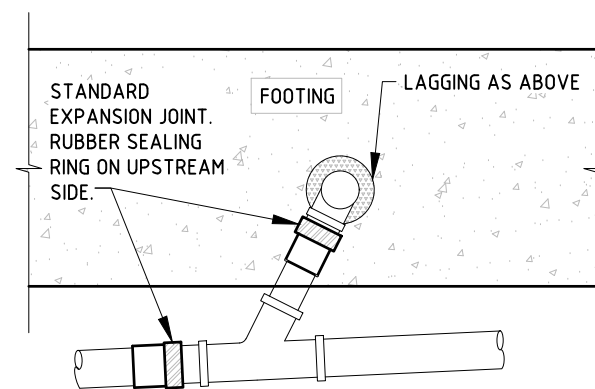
DETAILS WHERE PENETRATIONS UNAVOIDABLY CLASH WITH REINFORCEMENT
